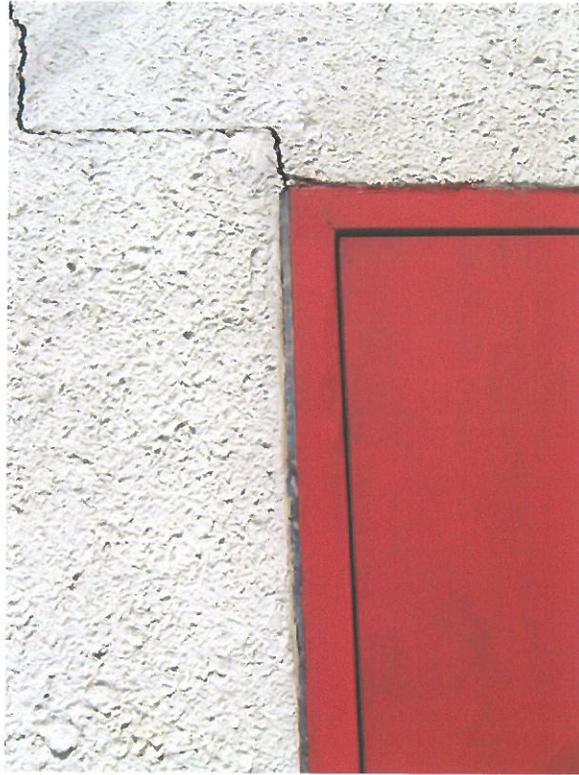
Close up view of crack at corner of man door. Note the width of the crack is approximately $\frac{1}{4}$ inch wide and that the sealant between the door jam and the masonry is not broken.
